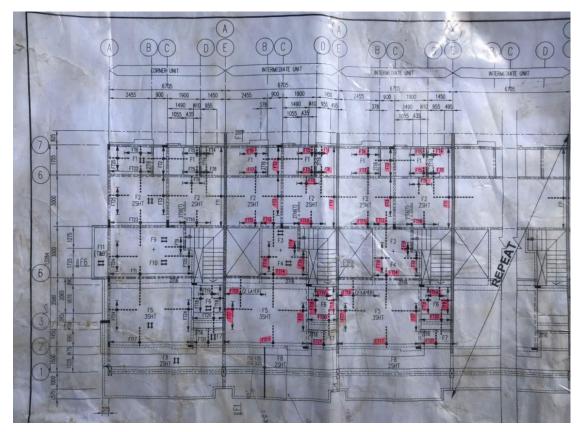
Image shows BRC A7 layout for 1st floor slab.
